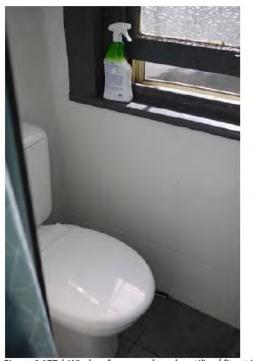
| Window frame, and modern tiling/ fitout in shared bathroom.
